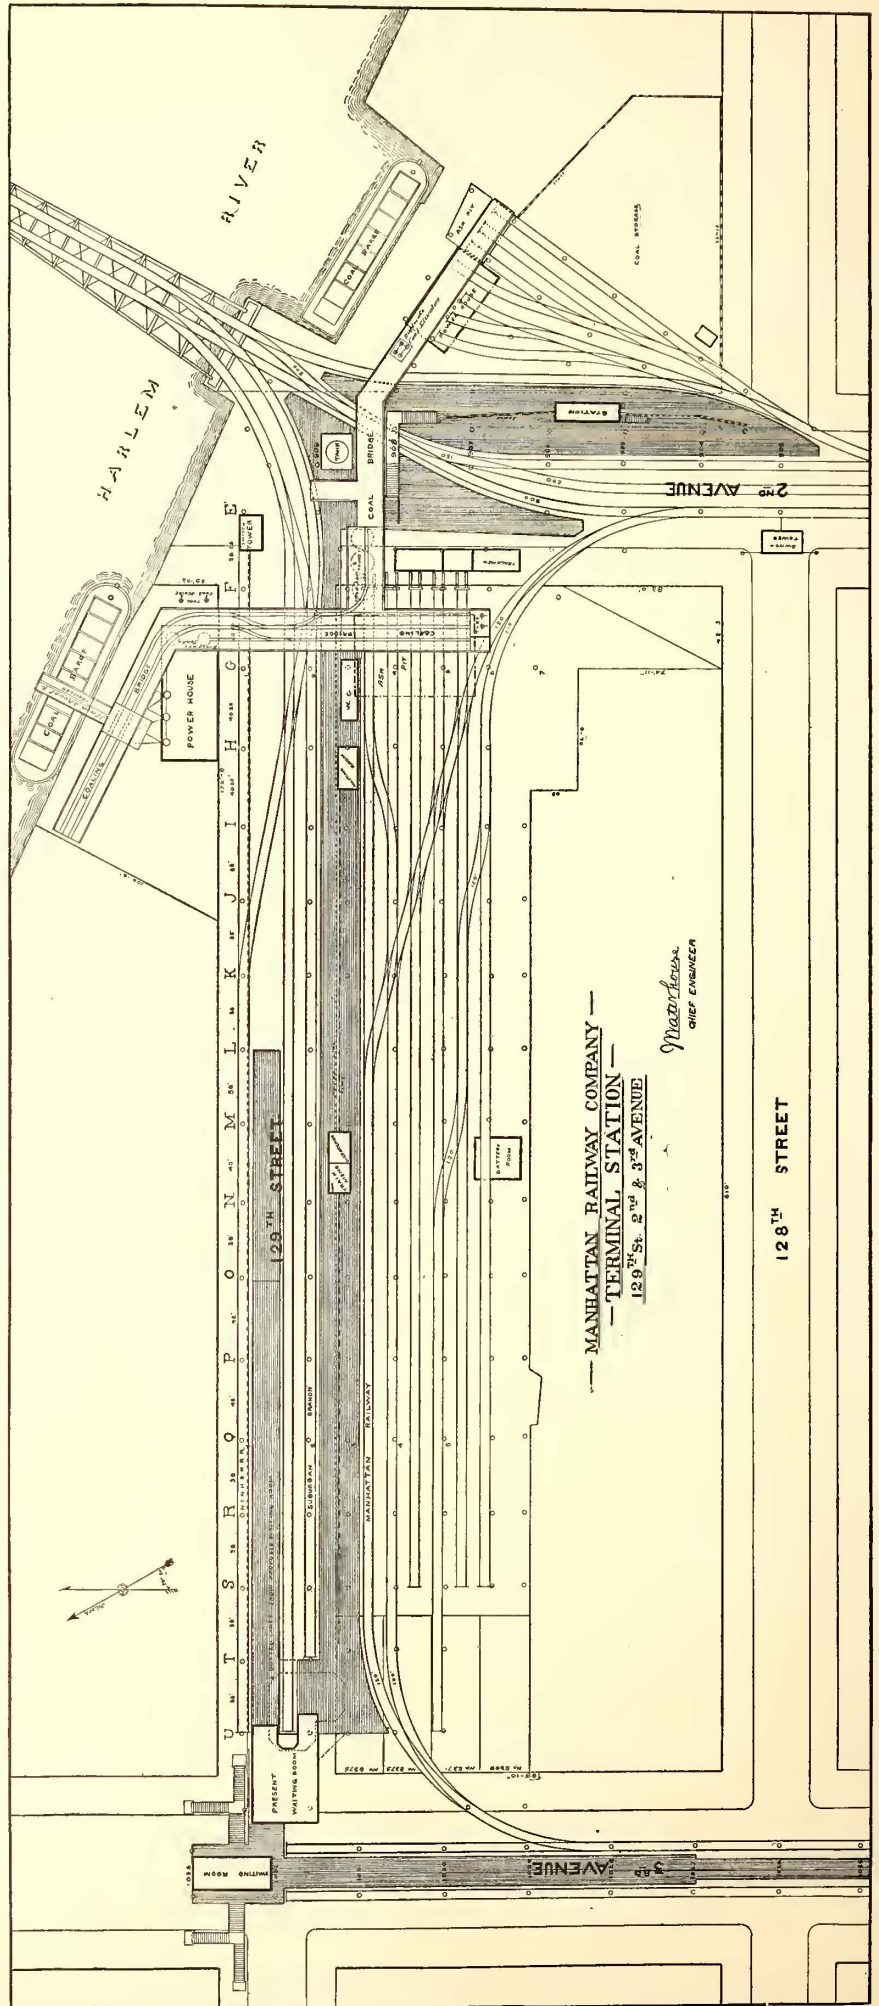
GROUND PLAN OF 129TH STREET TERMINAL STATION OF SECOND AND THIRD AVENUE ELEVATED RAILWAYS, NEW YORK.
